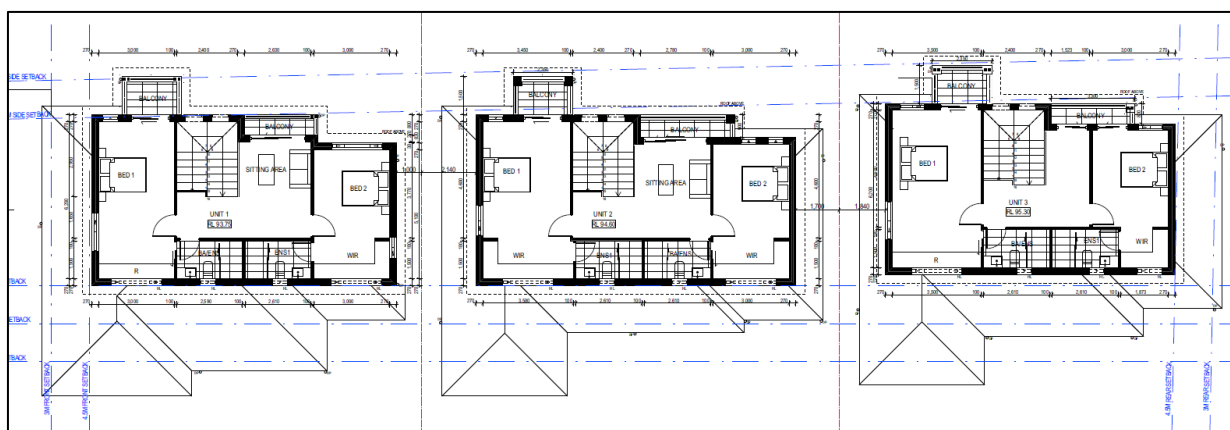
First floor plan of each dwelling showing that windows of habitable rooms are offset from each other.
